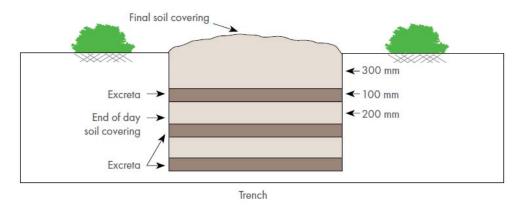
Disposal trench for sludge from on-site sanitation systems (Red Book, Section K)
